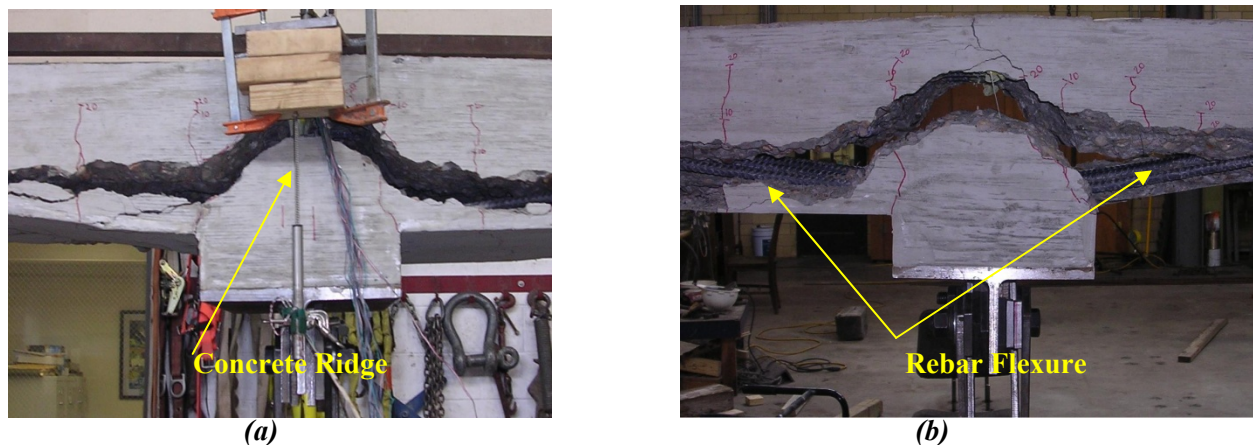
Failure Sequence for 9-in Studs Spaced Transversely (a) Horizontal Crack forming Concrete Ridge (b) Rebar Supporting WT
